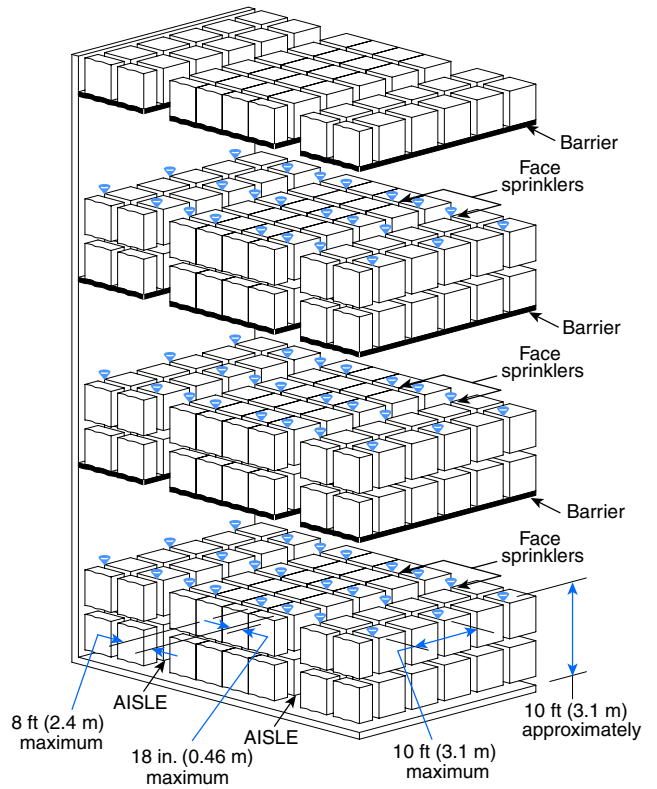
Positioning of In-Rack Sprinklers in
